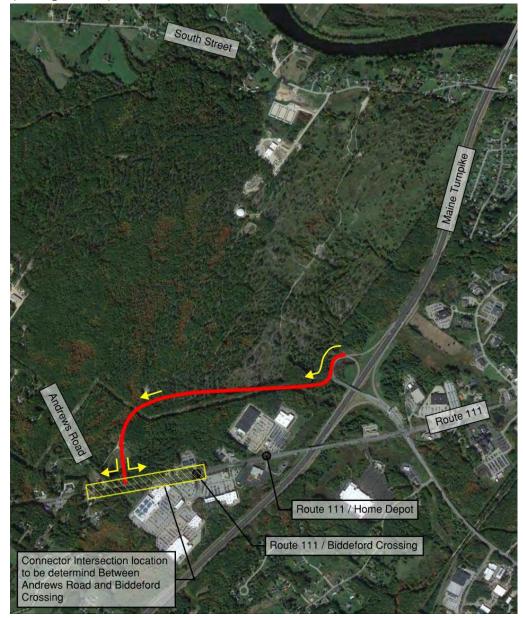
2028 MTA Exit 32 Planned Improvements
